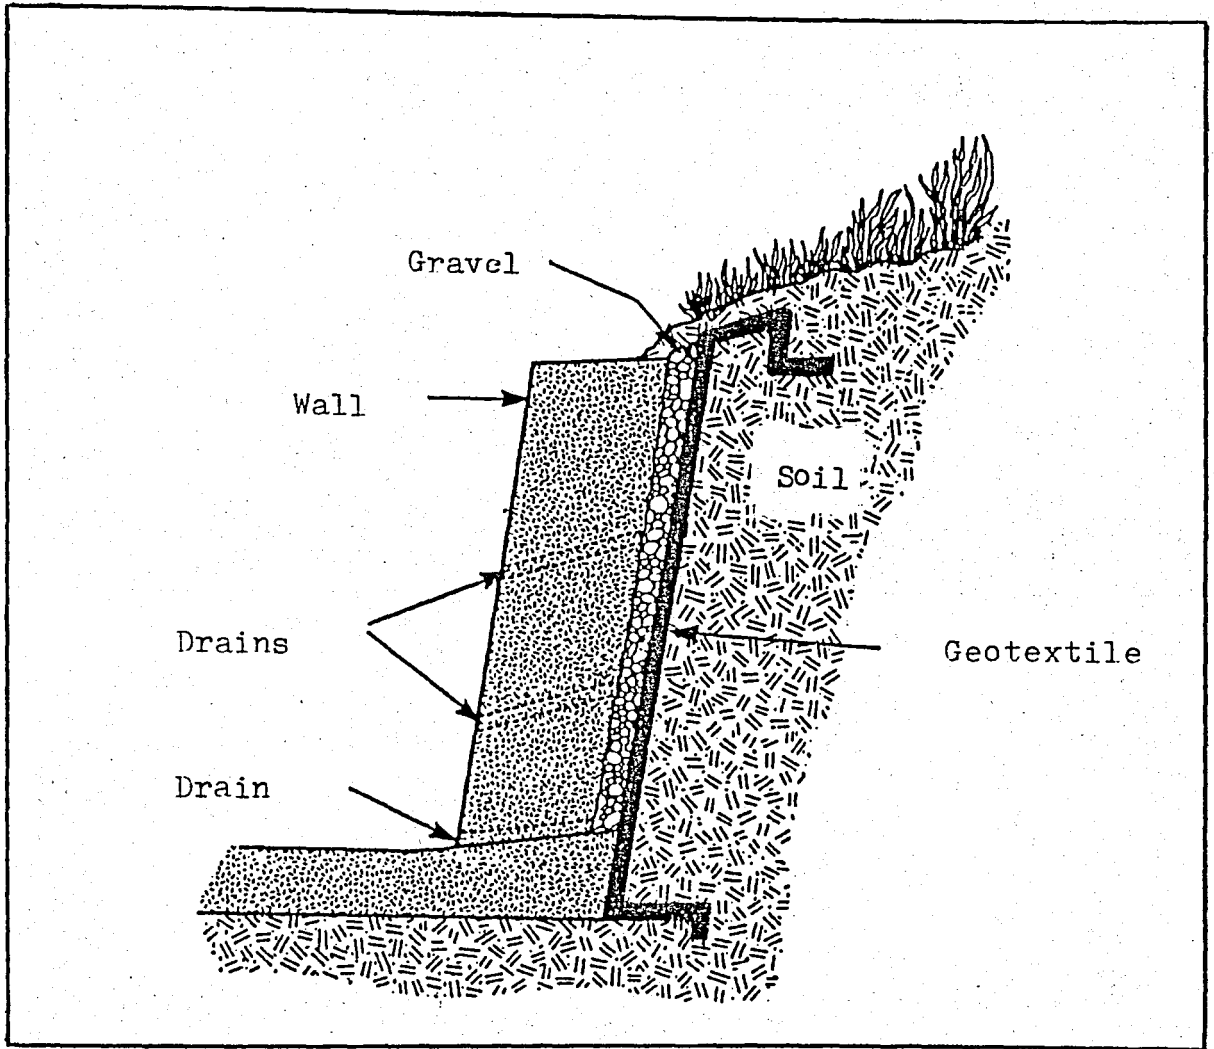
USE OF GEOTEXTILE IN RETAINING WALL
